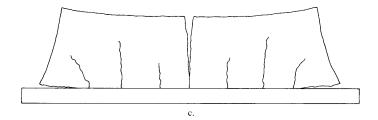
Tensile stresses and cracks in a wall built on a rigid foundation, due to shrinkage of the masonry [CUR171 chap. 6].
